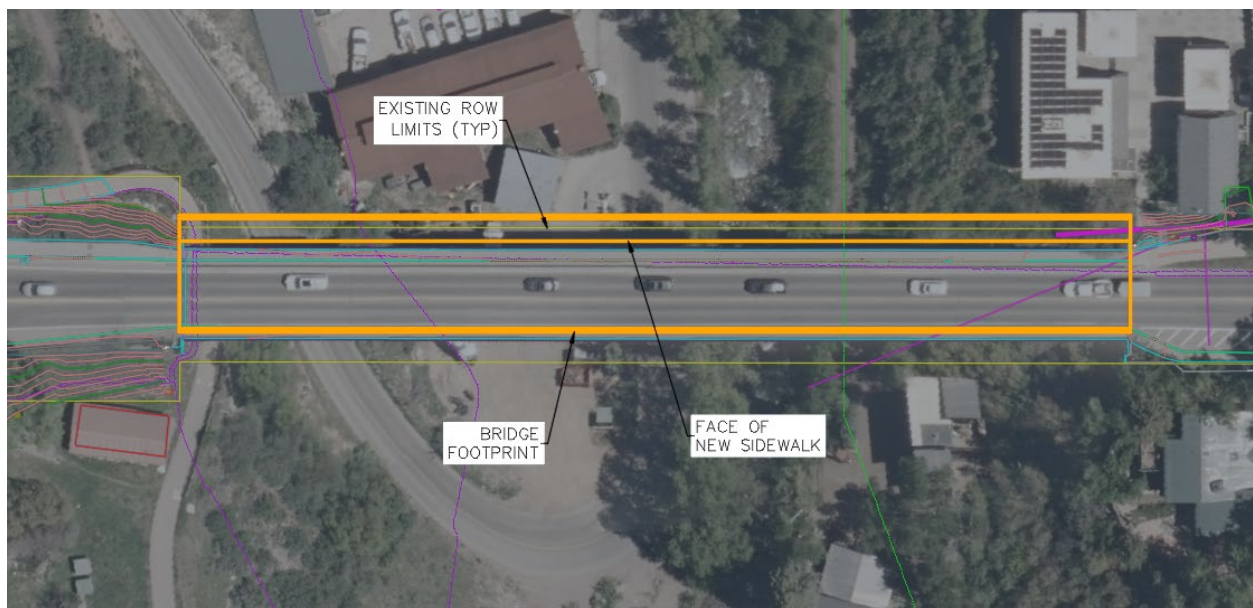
presents the resulting Three-Lane Shifted bridge footprint. The result is the bridge shifting to the north and being in proximity to the residential structures near the east abutment. Additionally, abutment and wingwall construction would be very close to the structures and is not recommended. Because of this, shifting the bridge to the north is not considered feasible.
